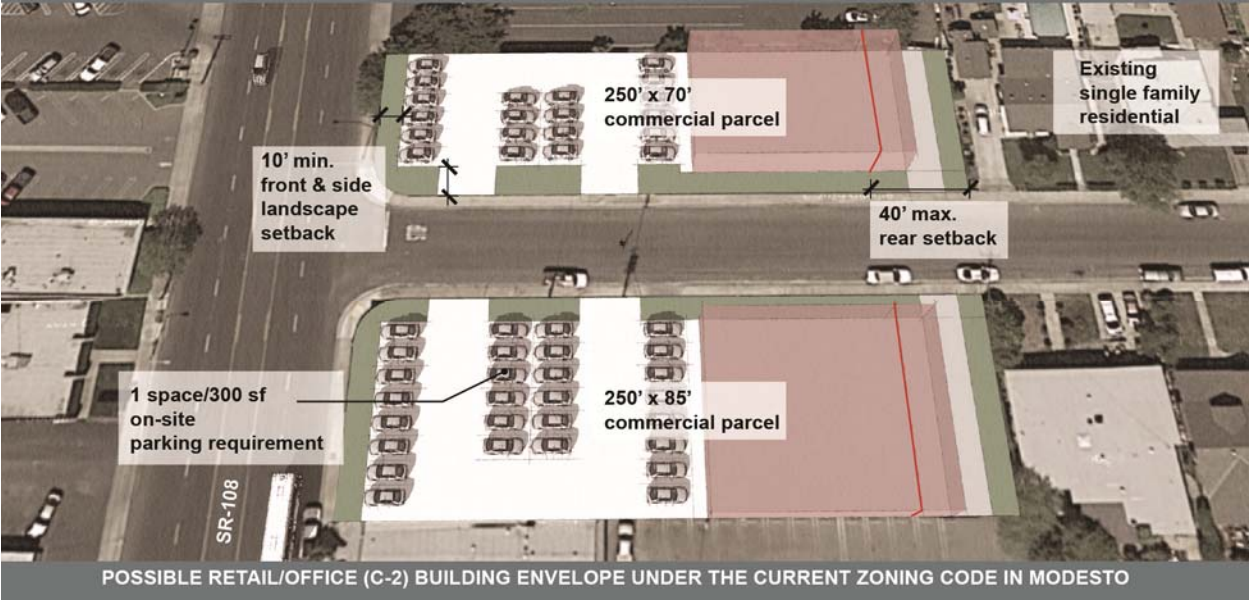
Site Layout Under Existing Zoning Regulations in Modesto
